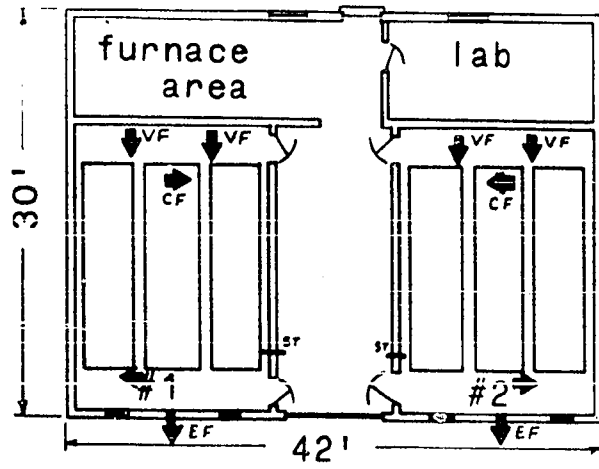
AISI building floor plan with the direction shown by an arrow and type of air movement shown by VF, CF, and EF indicating ventilation fan, circulating fan, and exhaust fan, respectively
